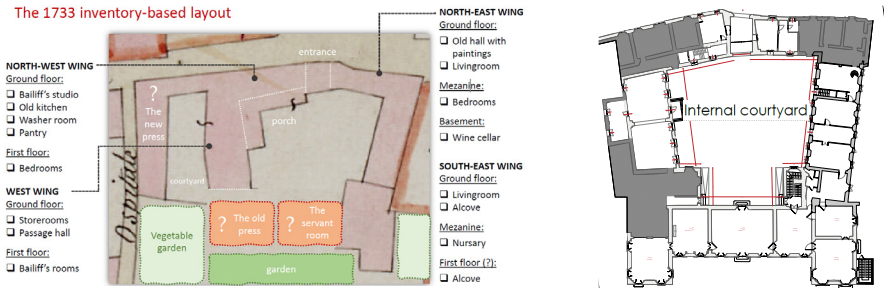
a) 1733s inventory based layout;(L. Cantini *, M. Previtali) b) ground floor plan
